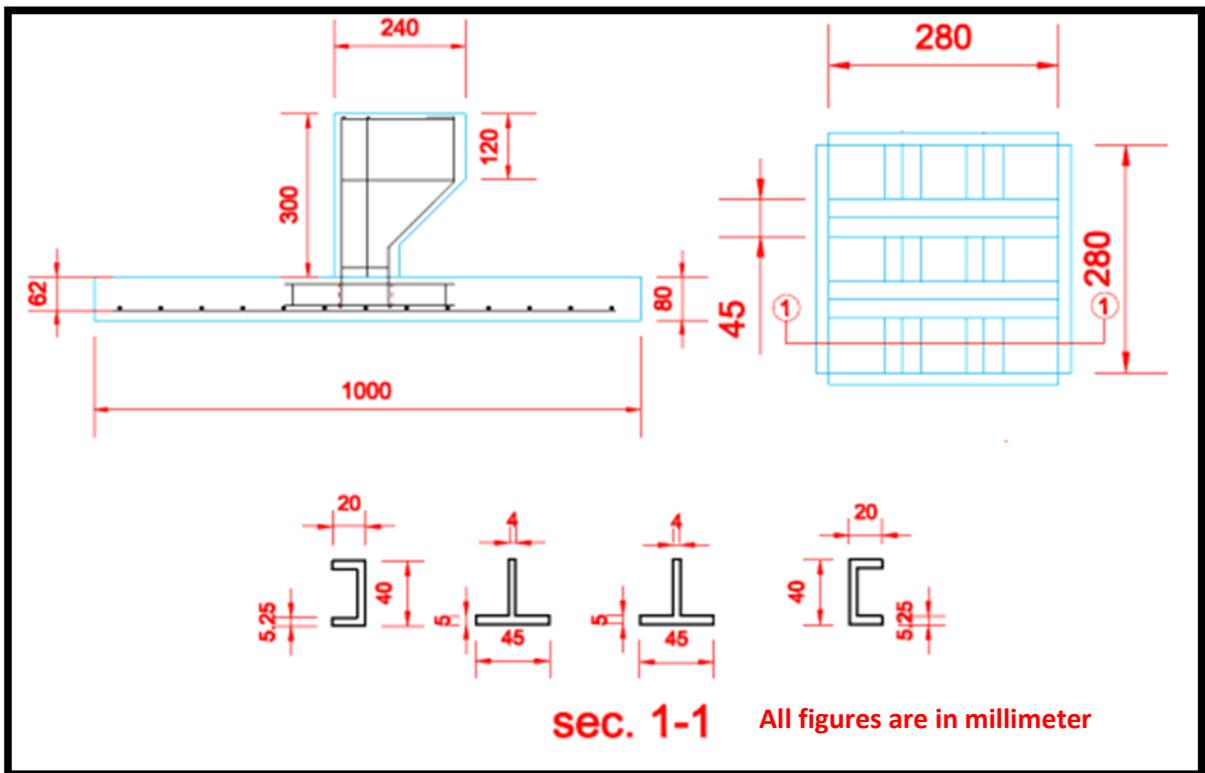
Dimensions and Layout of Slab with Shearhead of Double Cross Stiffeners
